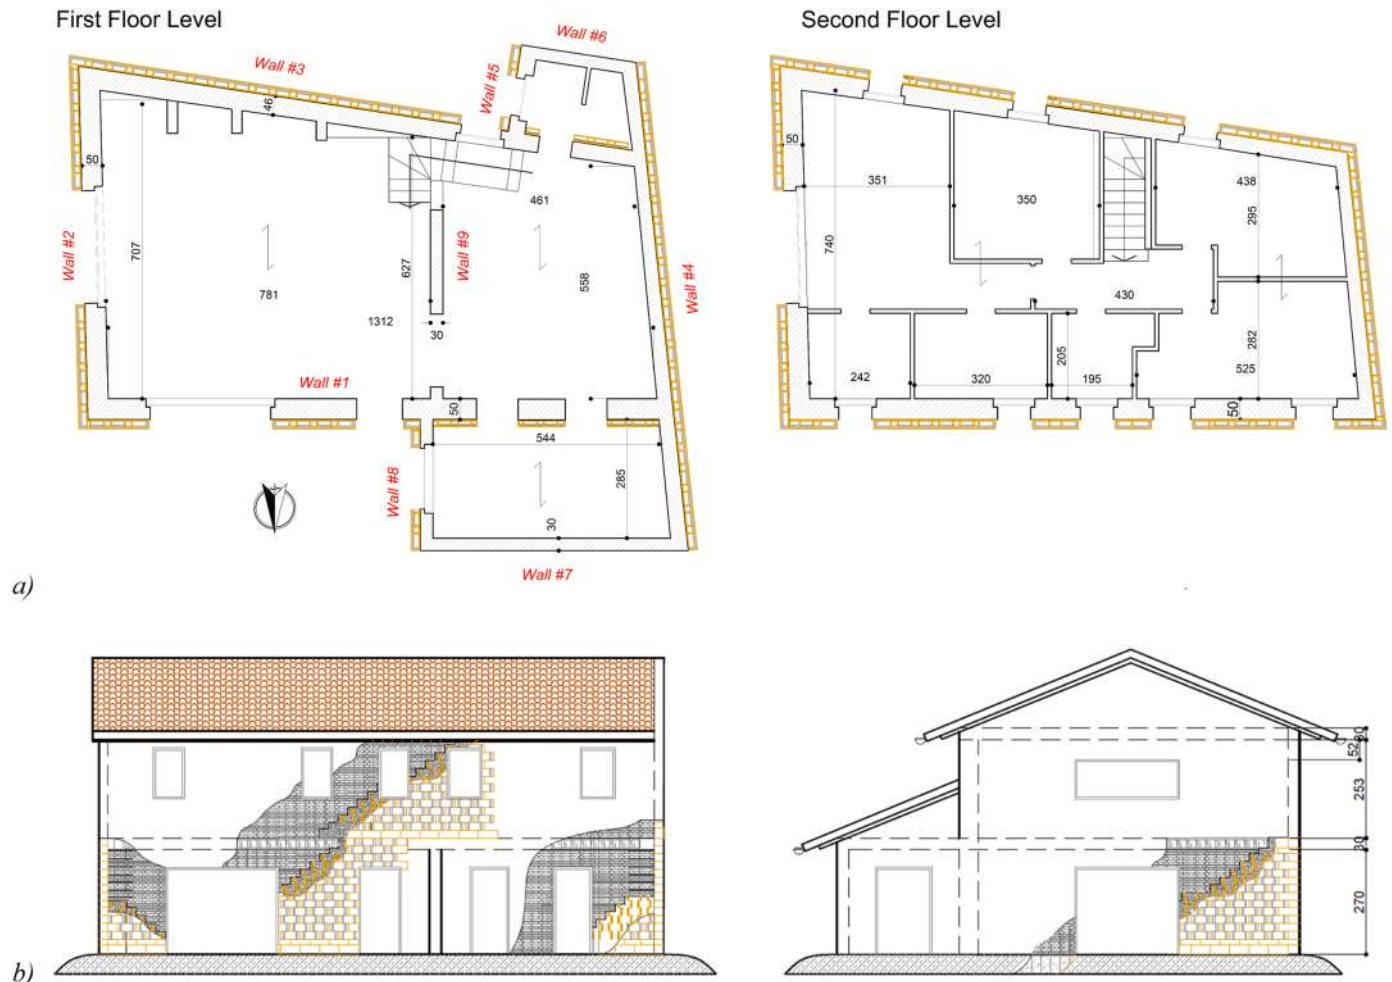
a) Plan and b) main front view of the considered case study building with application of the proposed retrofit system.
